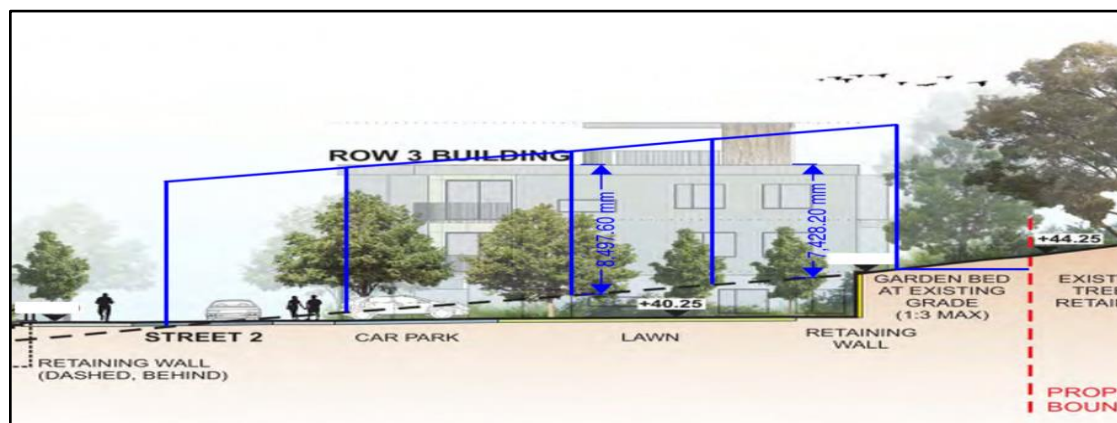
Building envelope determined by the Eastern boundary at Gale Street (primary frontage) as viewable from within the site at Southern Elevation 02. Note lift overrun is set further to the north of this elevation.
